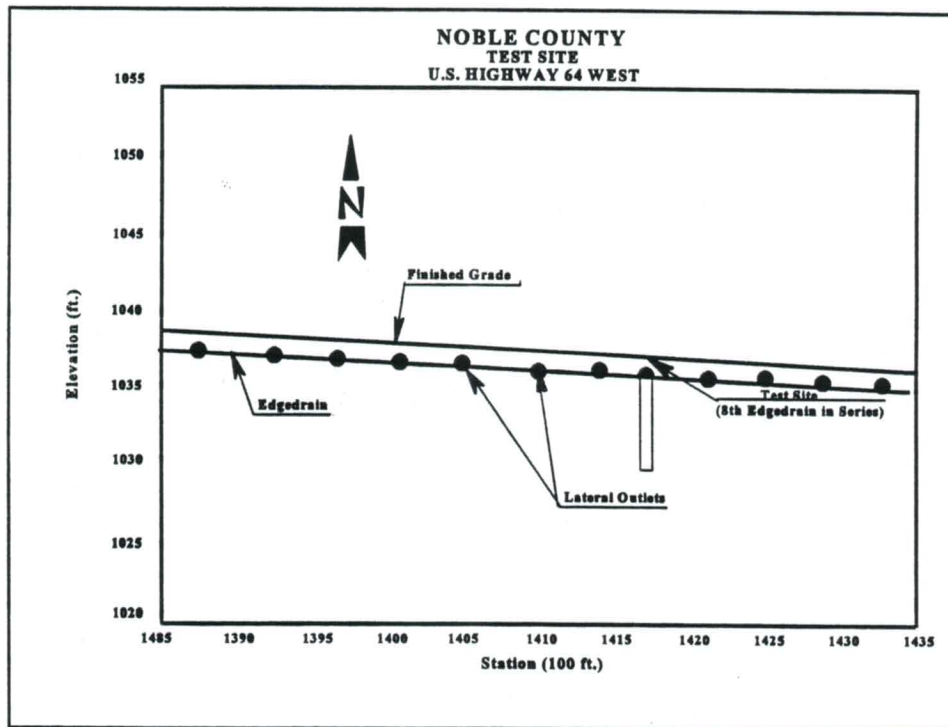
Longitudinal slope of the roadway at the Noble county site
